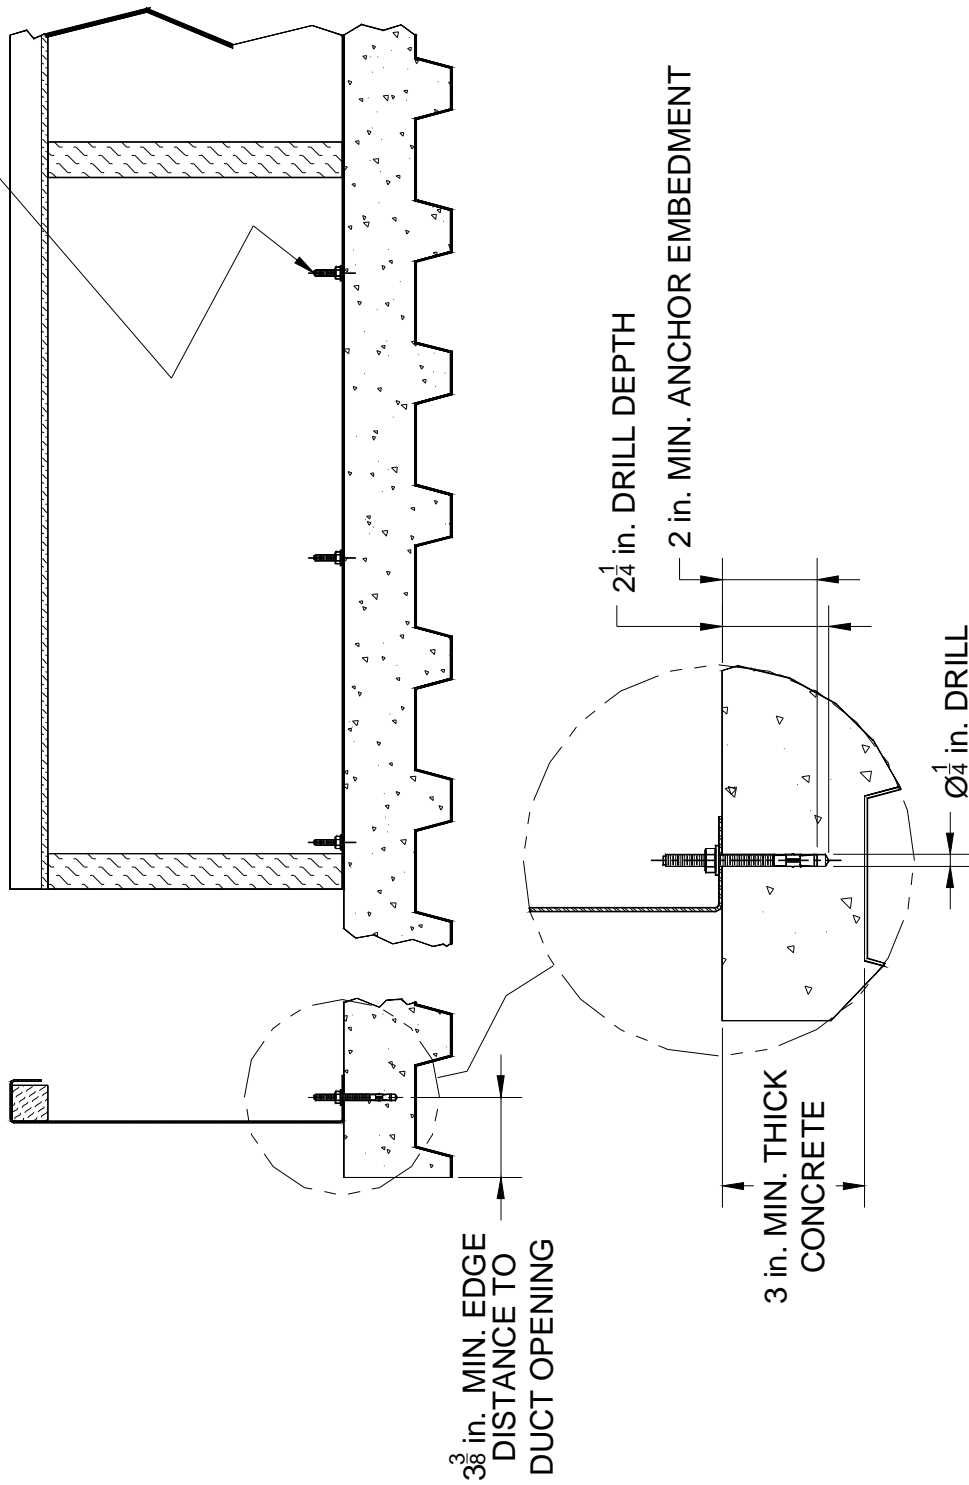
Attachment to Concrete Using Wedge-Type Anchors.
